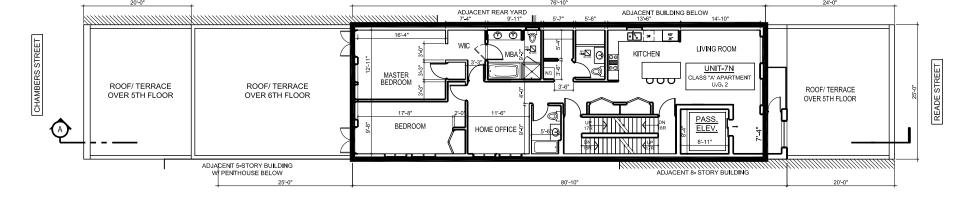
PROPOSED SEVENTH FLOOR PLAN
